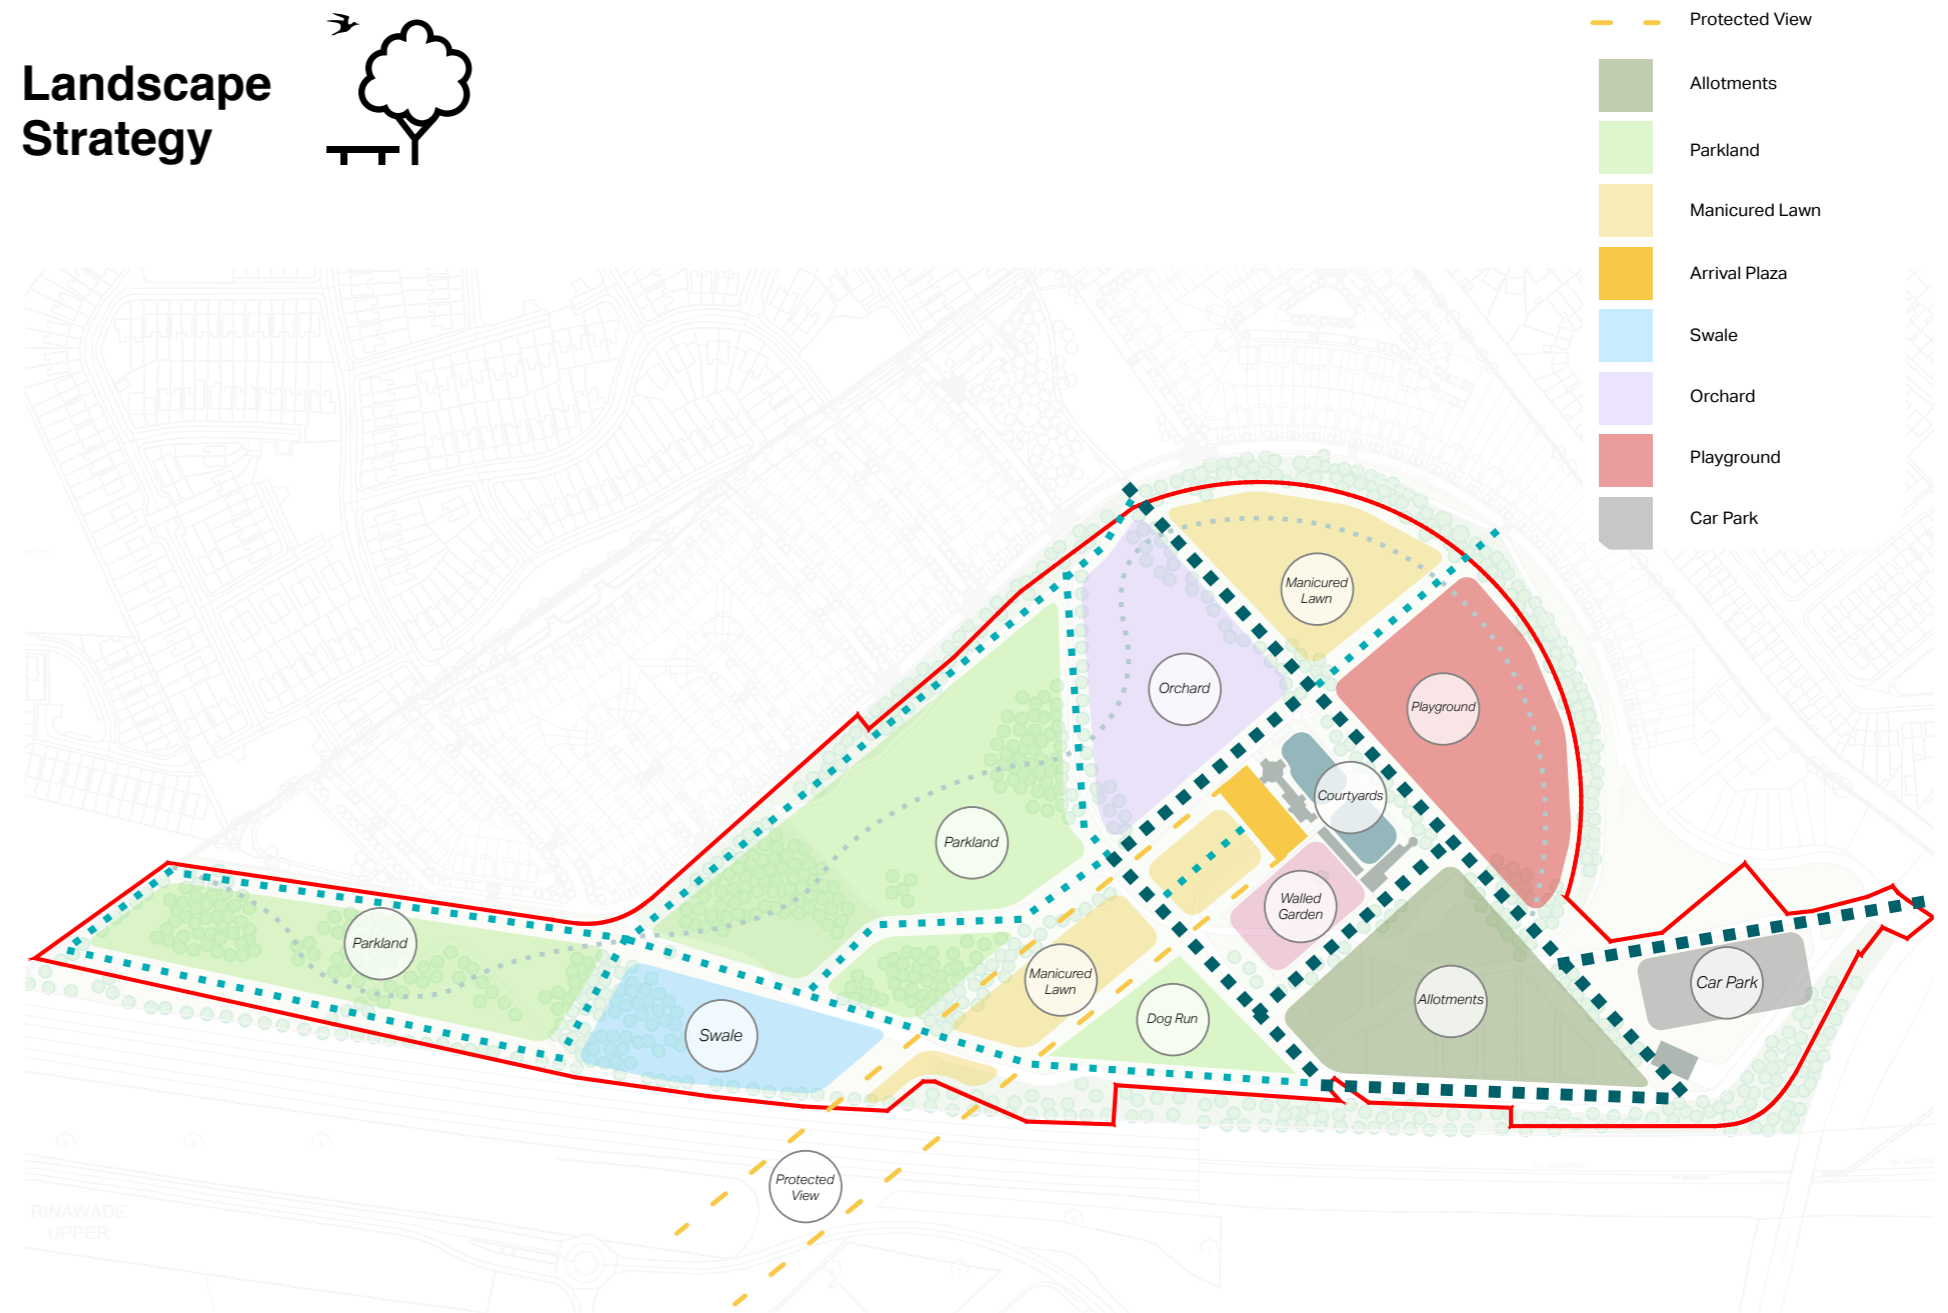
; Proposed Landscape Strategy See Landscape Architect Info for further detail
